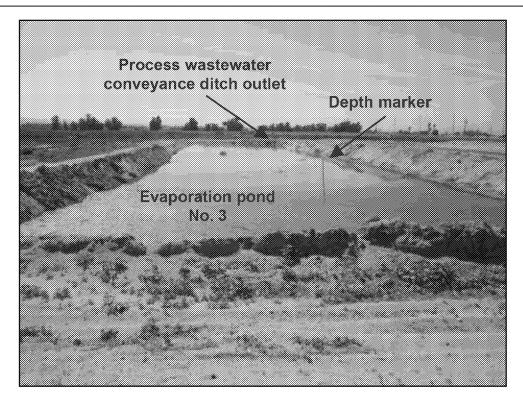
View facing south of the process wastewater conveyance ditch along the west perimeter of the Facility. Note the ditch was actively conveying process wastewater into evaporation pond No. 3.
